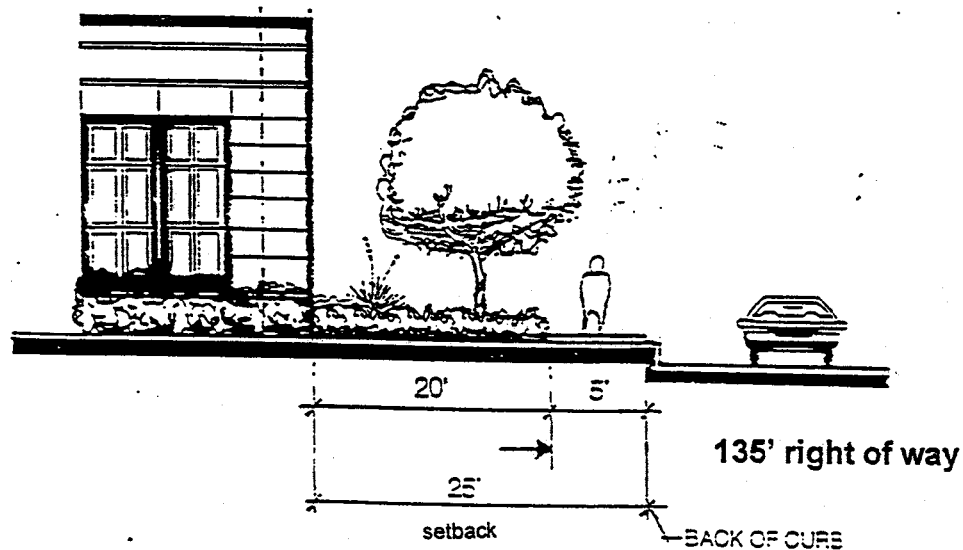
VEHICULAR AND BUILDING SETBACKS, BUILDING HEIGHTS
